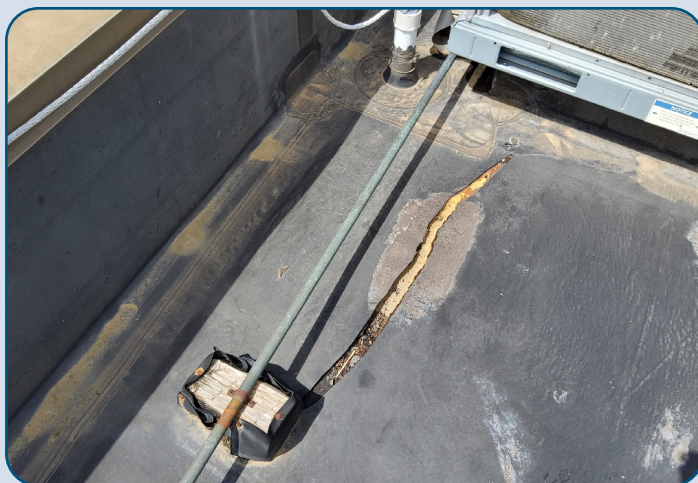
AATT Toll Plaza Electrical Room Roof Damage.
